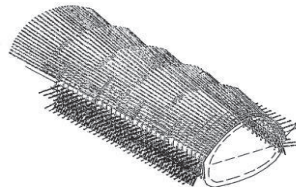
Three dimensional appearance of a tunnel with umbrella pipes and rock bolts.
